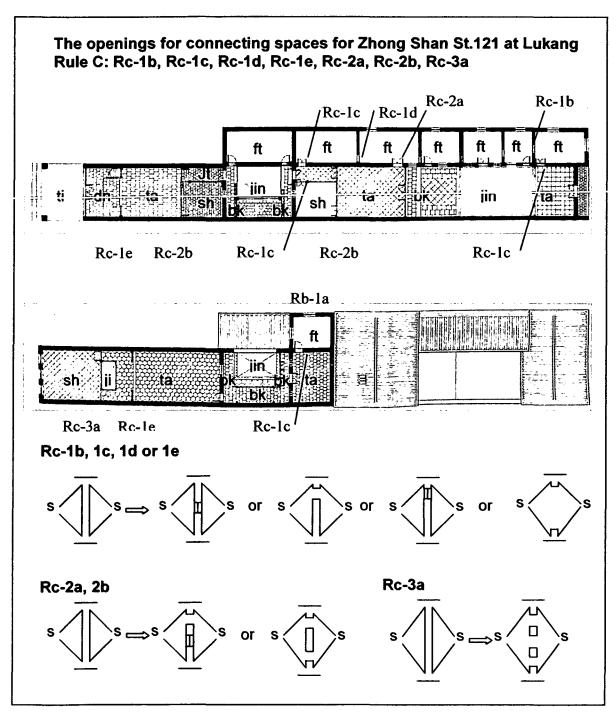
28 Rule C to illustrate the openings on inner walls of floor plans at Zhongshan St.121 in Lukang
